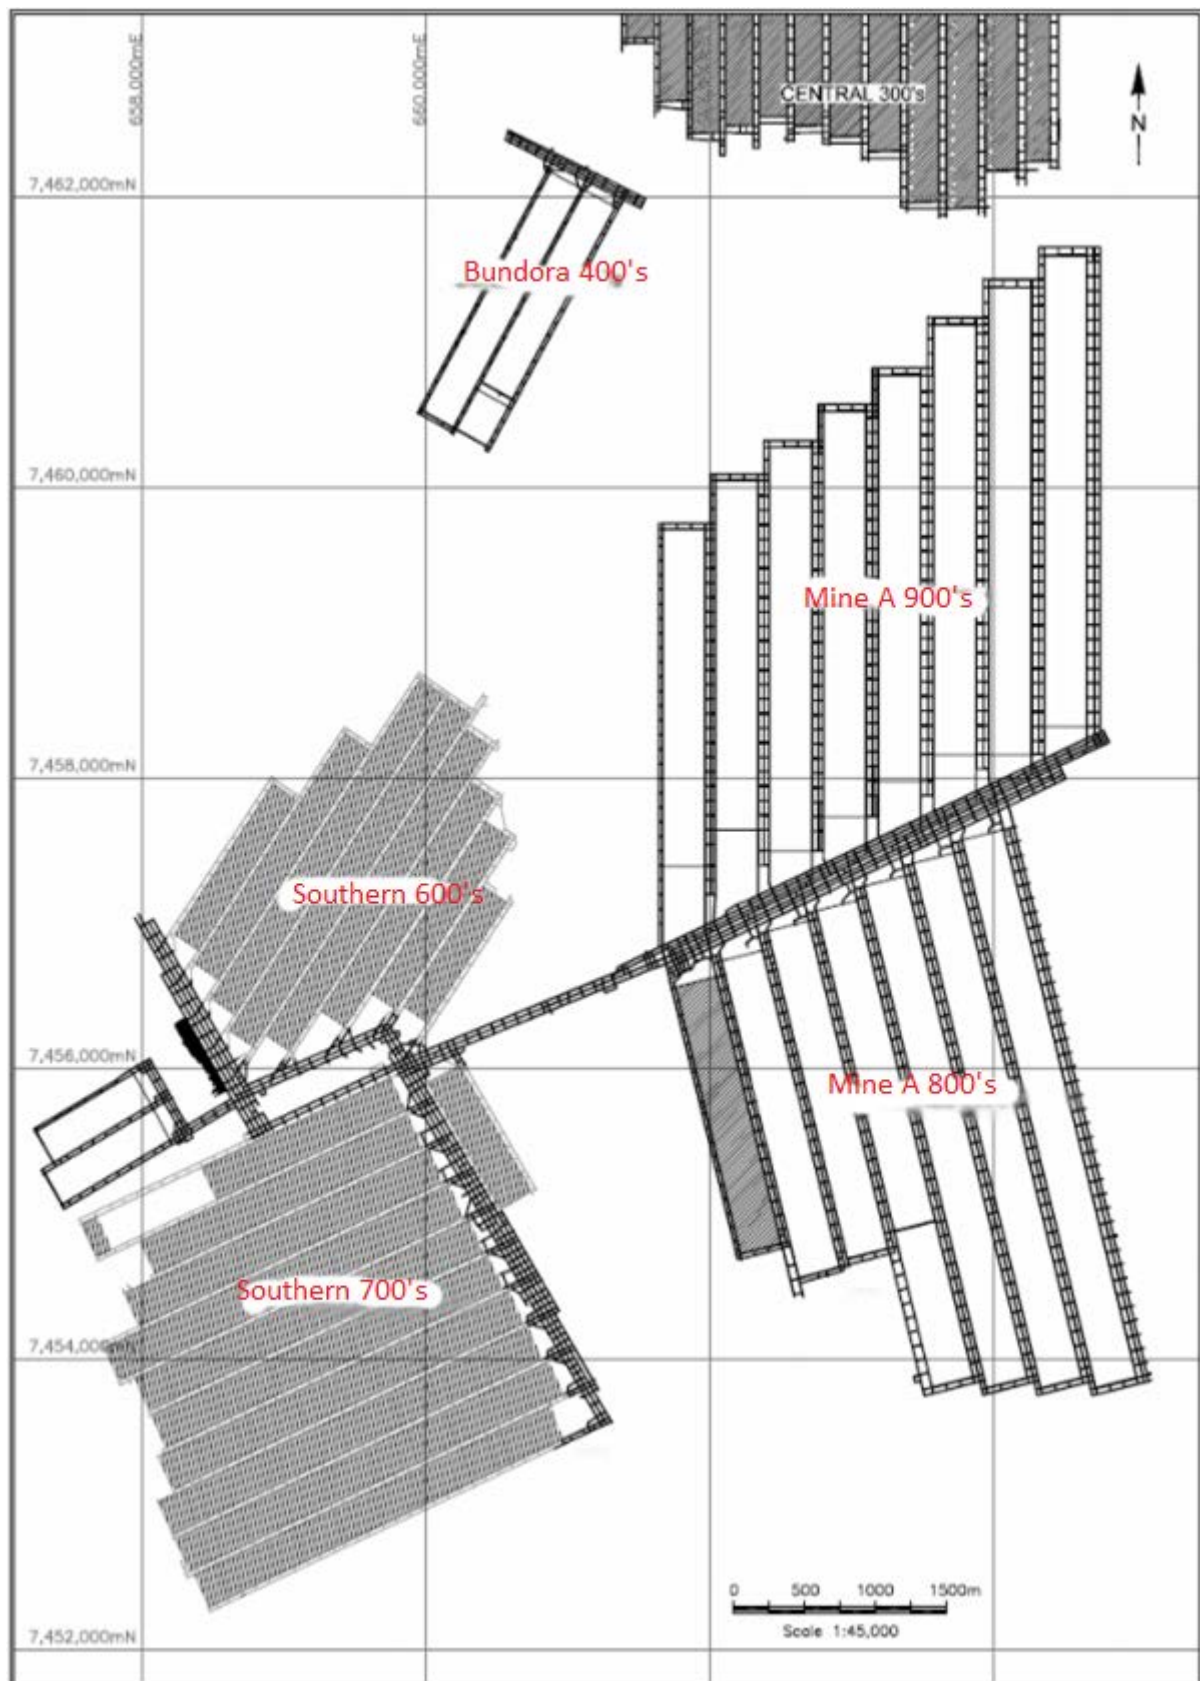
Mine A underground longwall mine layout (Colwell *et al*, 2008)
